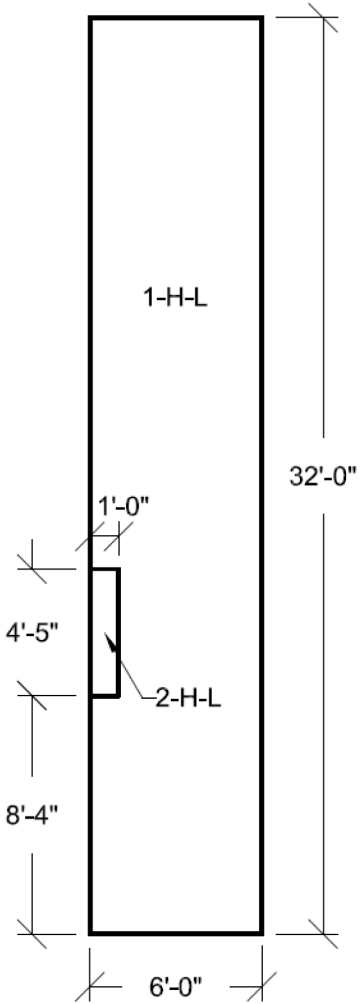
H.6-153 DGFOV Slab 3 Looking Down
